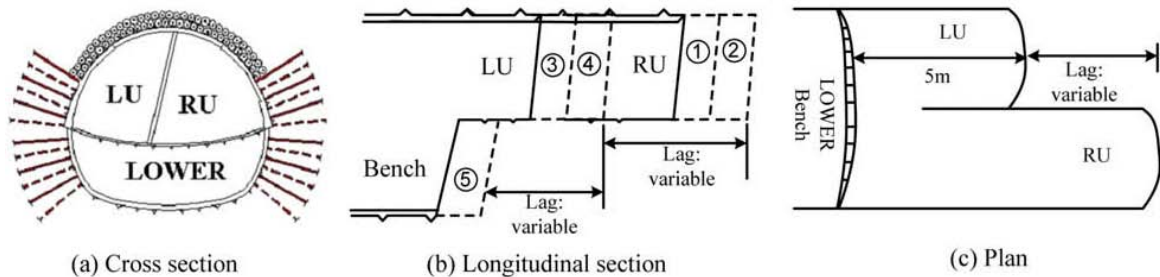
Cross-section and excavation sequence of sidewall drift method.
